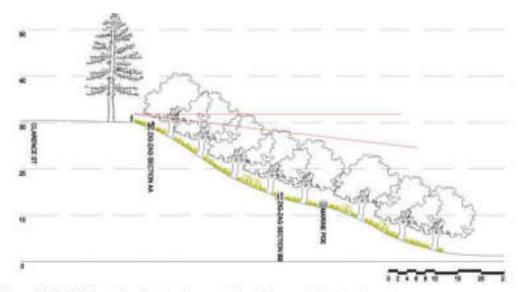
Typical section of natural revegetation placement slope treatment
